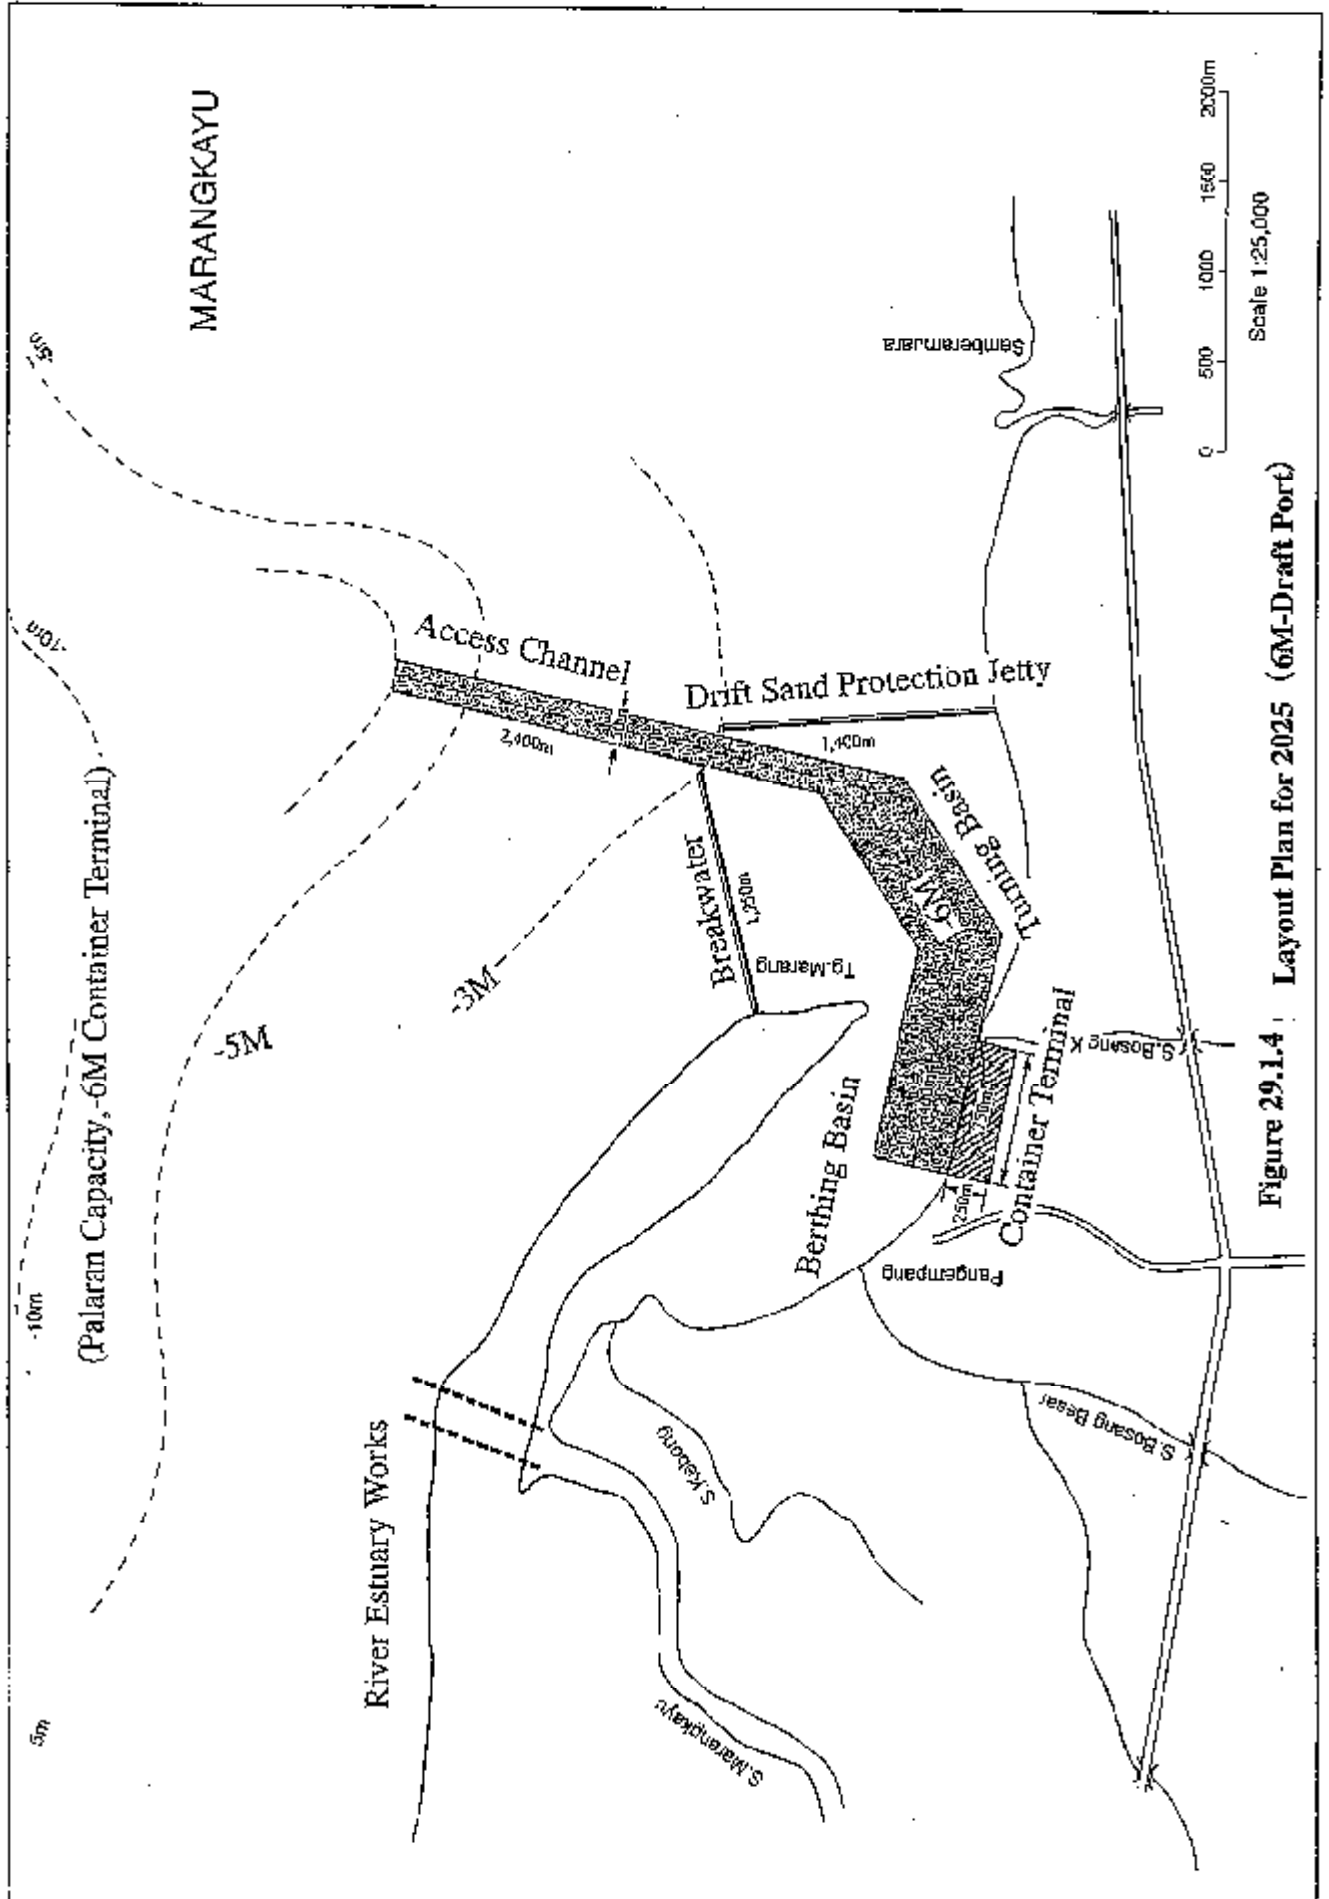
Layout Plan for 2025 (6M-Draft Port)
